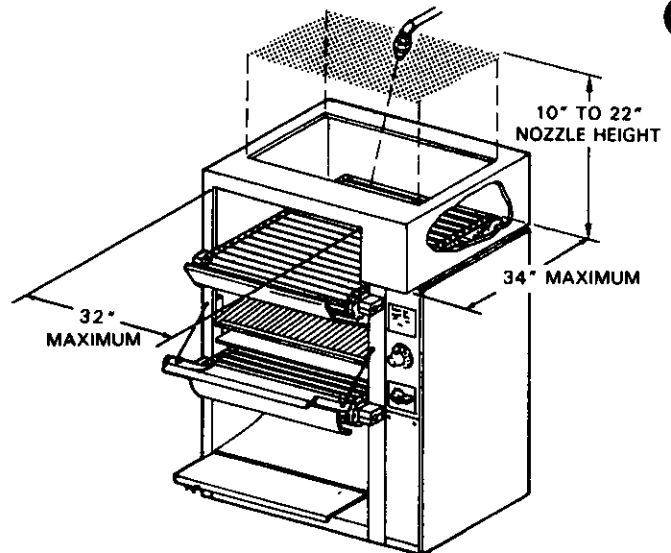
Nozzle Location, Automatic Broiler with Open Hood
